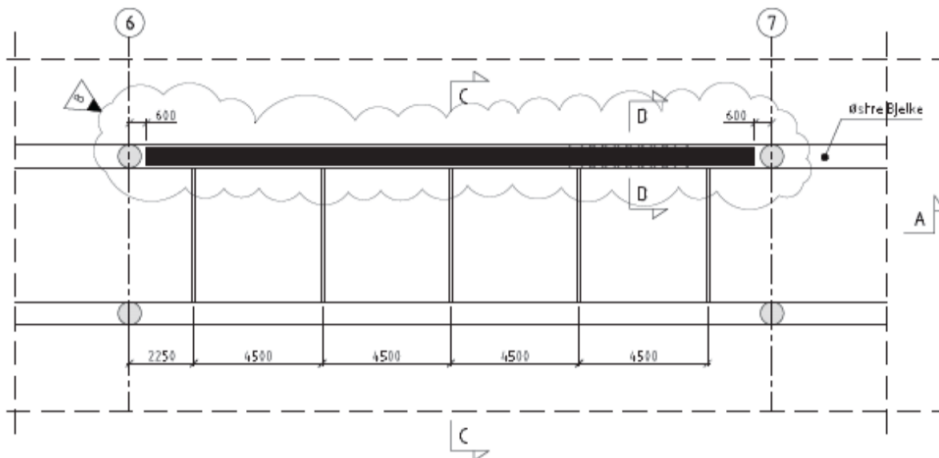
Details of CFRP reinforcement at the beam seen from underneath [34]
